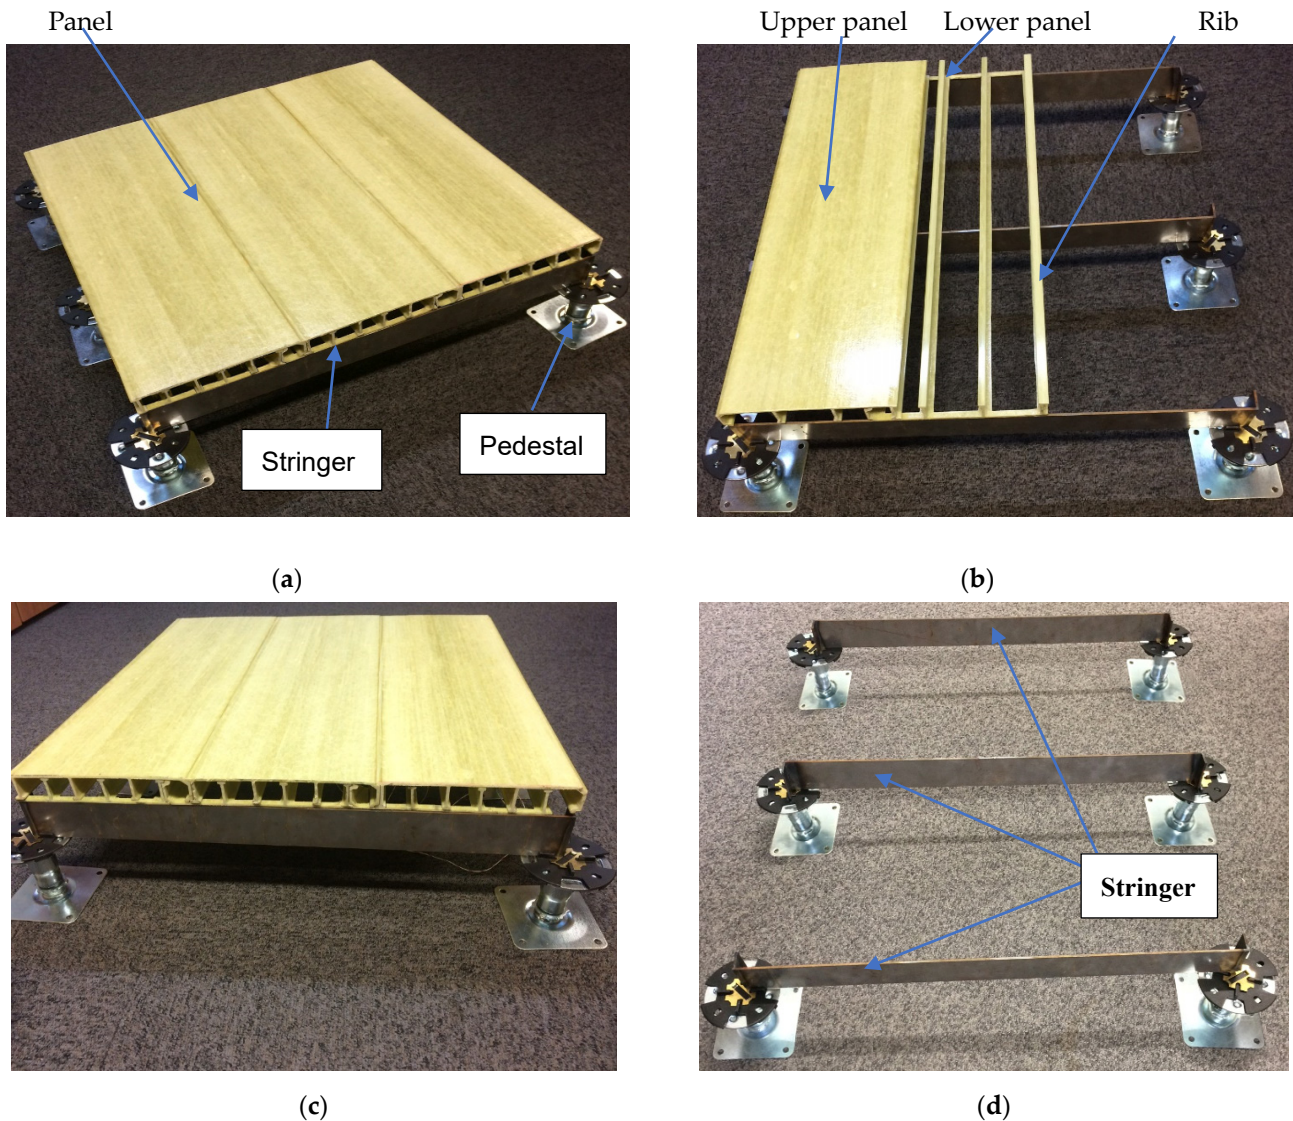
New raised flooring product. (a) Overview of the raised floor; (b) Assembly of an upper piece and a lower piece; (c) Assembly of three upper pieces and three lower pieces to form the panel; (d) Stringers and pedestals supporting the panel.
